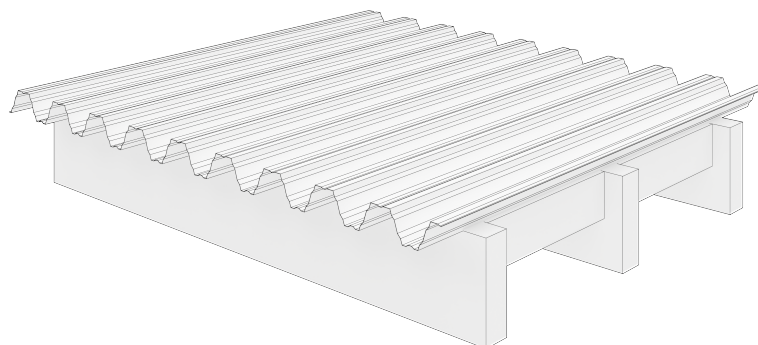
Illustration of a beam bridge with a trapezoidal plate.
